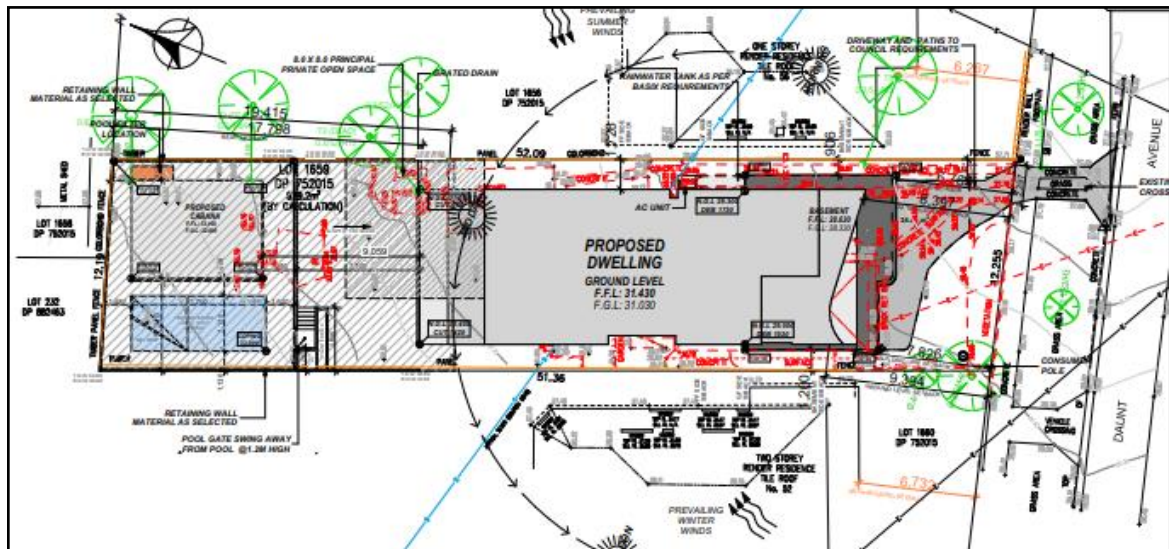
Site Plan for 54 Daunt Avenue - Source: Prime Design Studios
